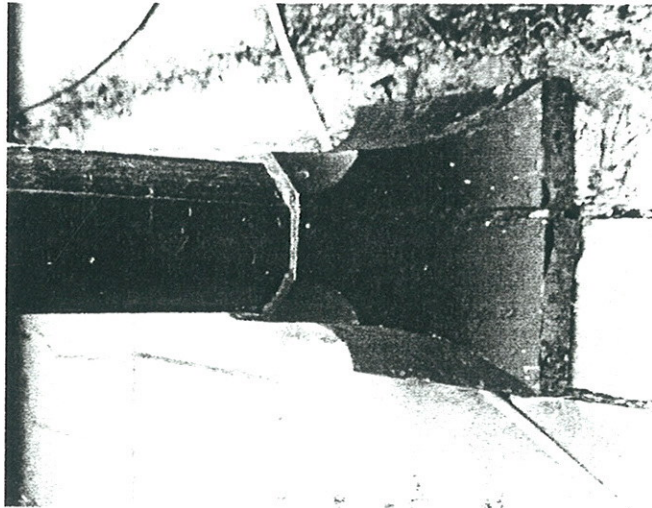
Foundation column found exposed at the concourse side of the void beneath the floor of the west waiting room.
